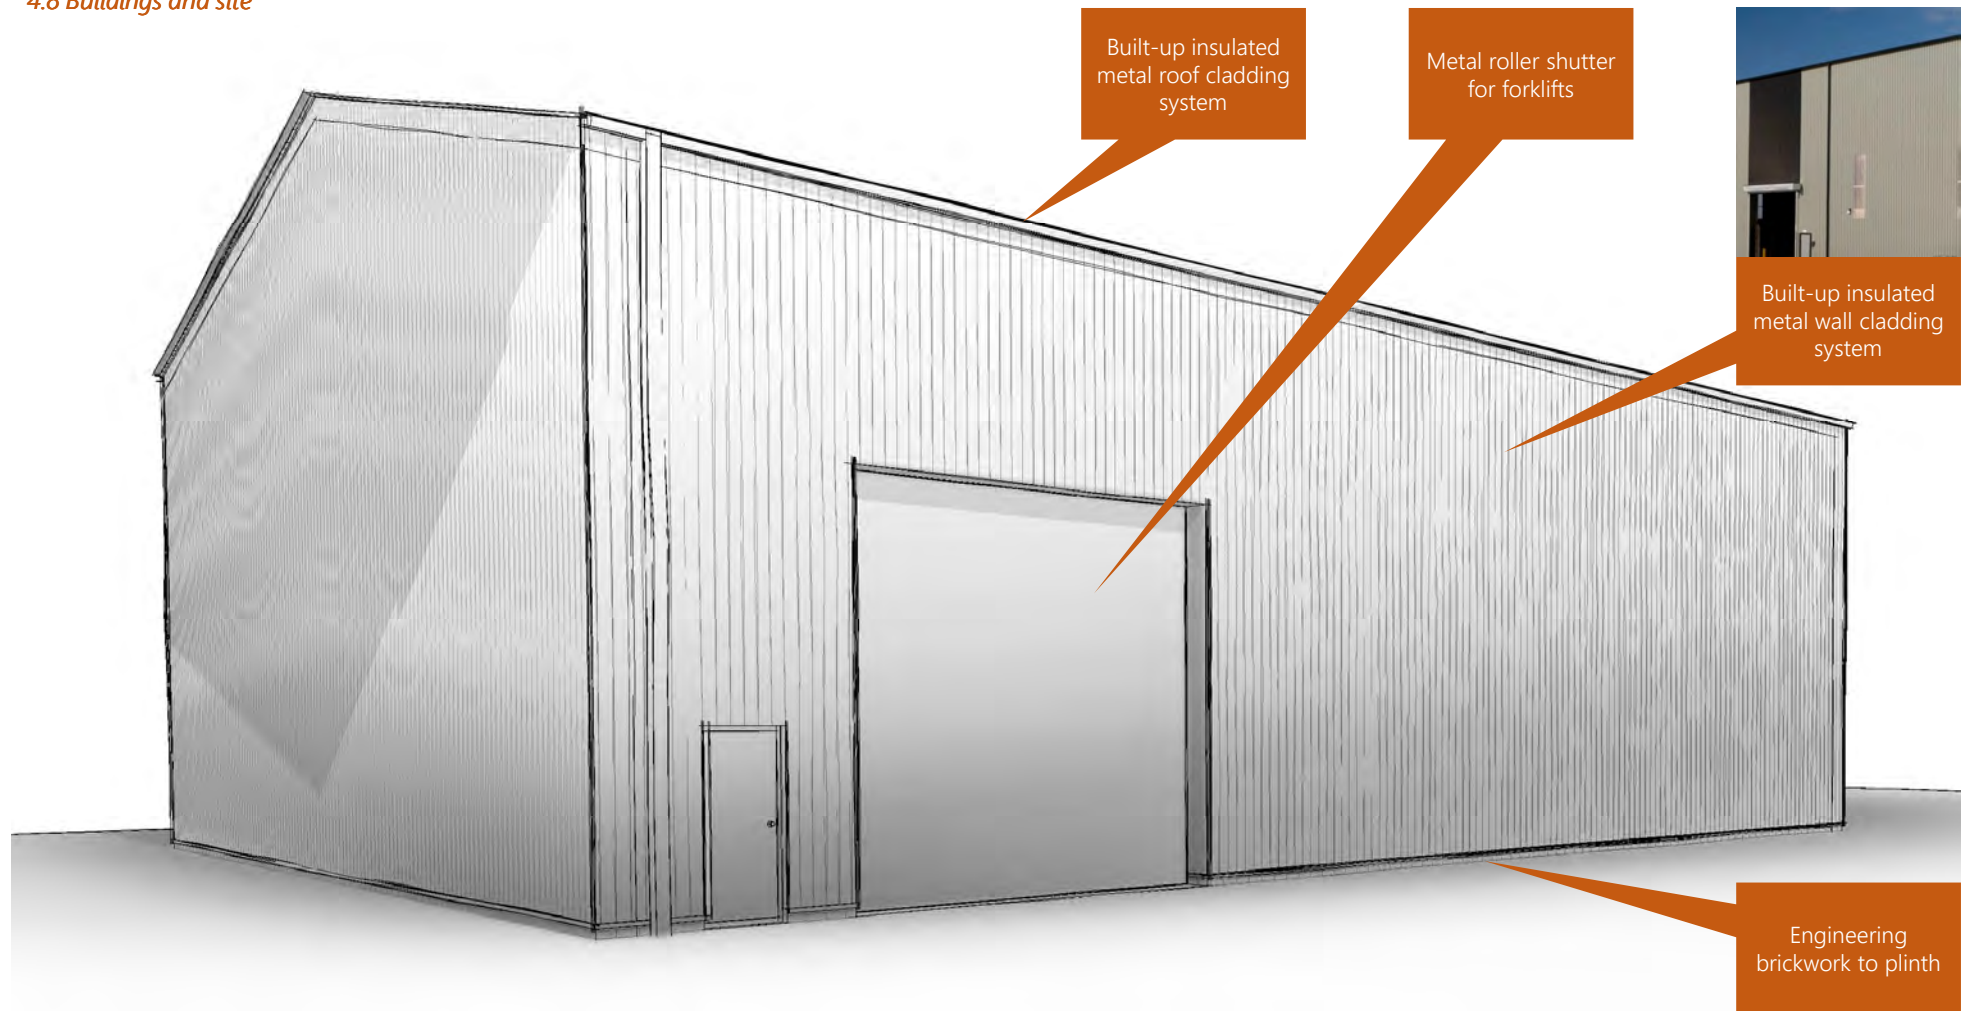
The warehouse building is an economically constructed, tall storage unit with large format roller shutter doors and personnel access. The building is secure and utilitarian in nature and will store components for the industrial process and related consumables.
